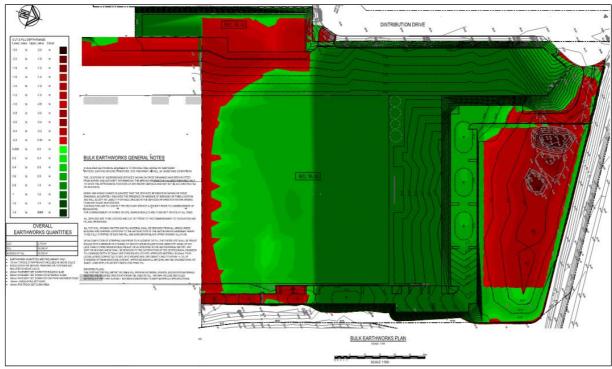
Earthworks Plan (Source: Henry & Hymas, 2021)
